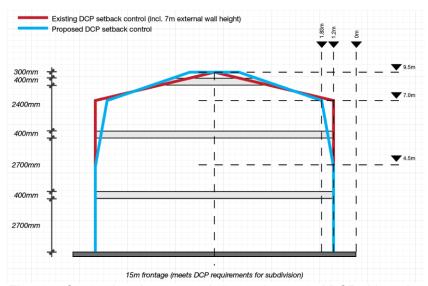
Comparison between existing and proposed DCP side setback control (15m frontage) The side setback profile accommodates the required two storey street frontage presentation for the dwelling, meets the Apartment Design Guideline (ADG) required minimum floor-to-ceiling height, and permits a habitable space within the dwelling's roof form.
